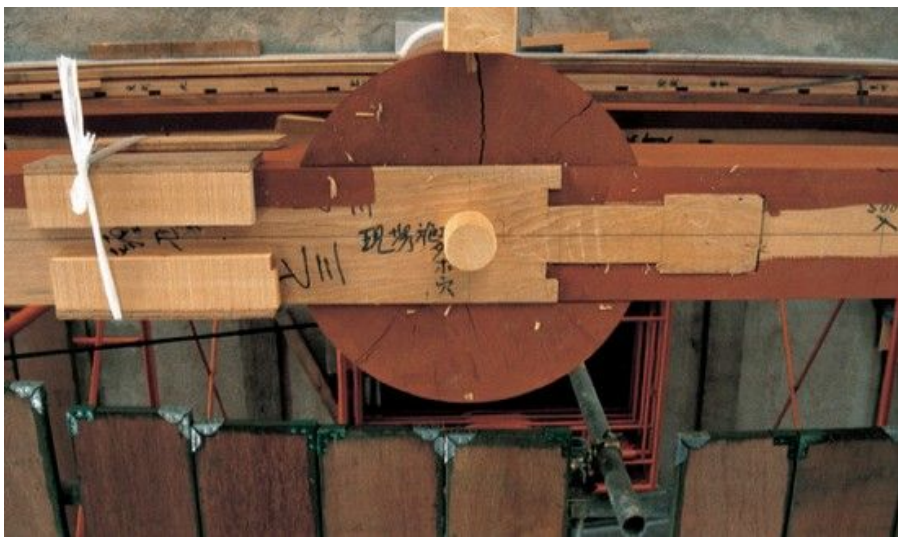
Square-headed “gooseneck” splices were used on head tie beams where they joined over columns.
